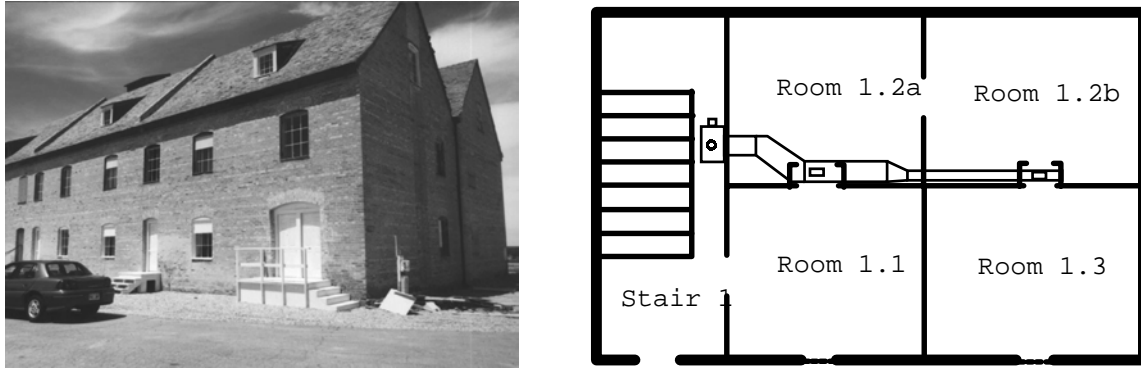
The three-floor building and plan view of the first floor with air handling unit.
